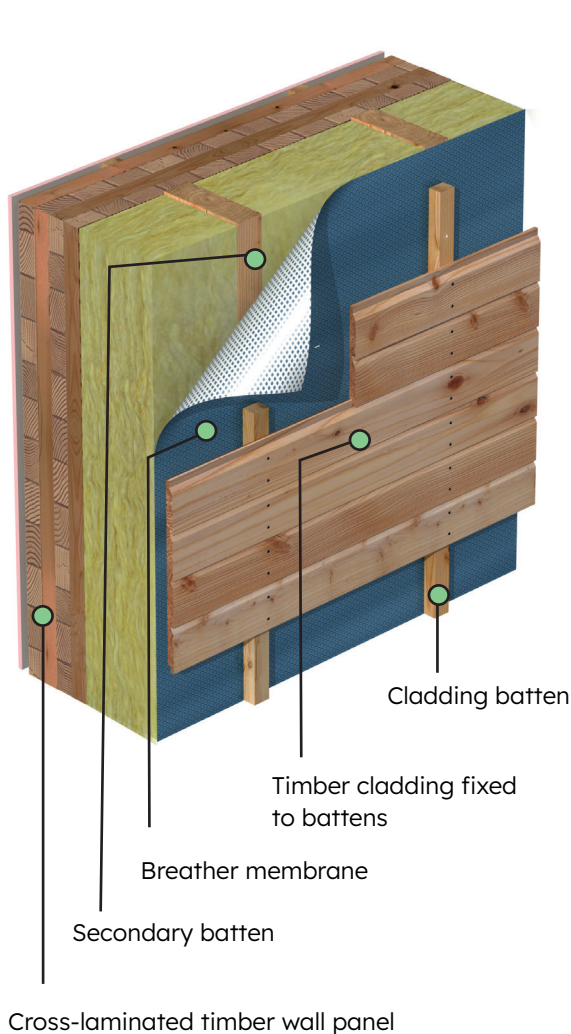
IMAGE: Method B, cladding fixed to the existing wall via deep secondary battens
